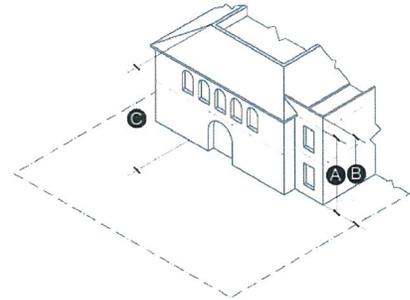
Plate height 'A', maximum height of flat roofs 'B', and the maximum height of pitched roofs without a linear horizontal ridge line formed by the juncture of two sloping roof structures 'C' are each addressed by the recommendations language.
